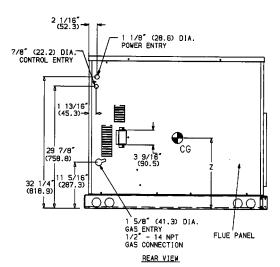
48SS048,060 Without Base Rail, Unit Dimensions
